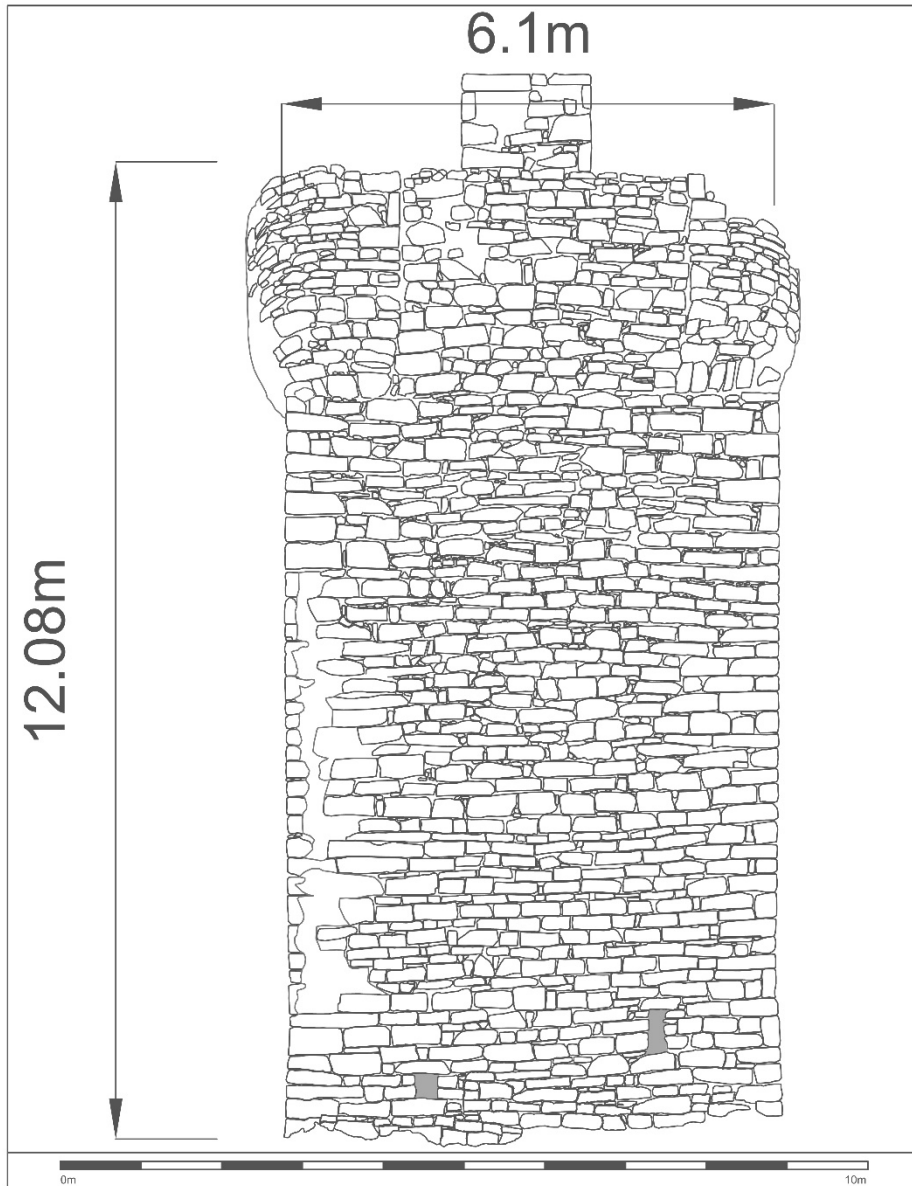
External elevation of the east wall of the signal tower at Glash Signal Station. The two chutes which pass through the wall are shown in grey.
